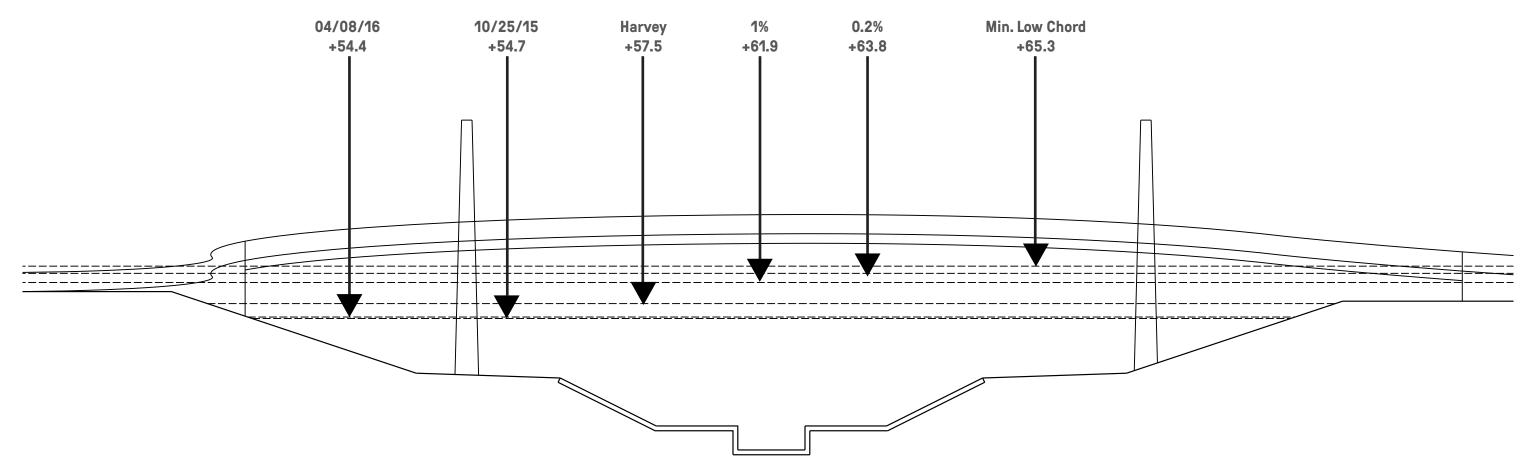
Flood Elevations (Elevation View Looking Upstream): Major high water events noted with the 1% and 0.2% chance the required minimum low chord elevation.
